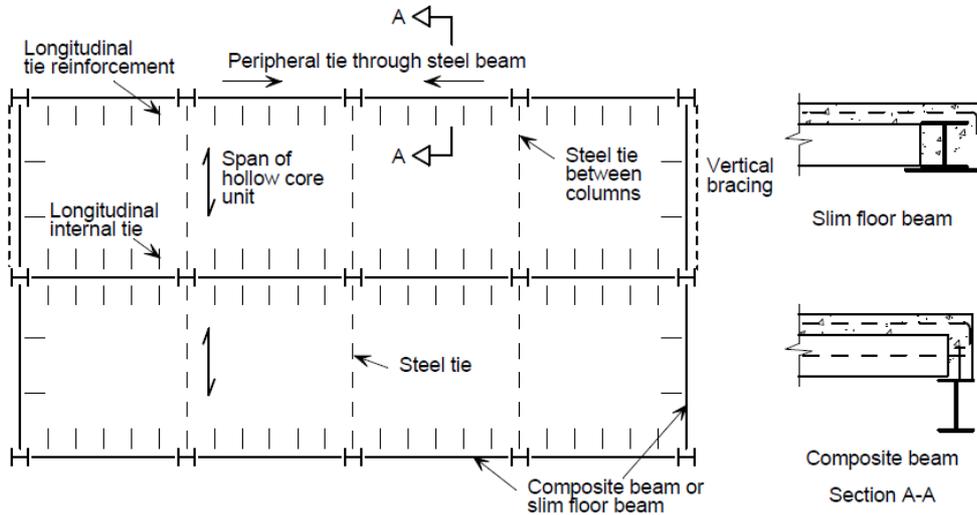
Tying action in the floor plate using precast slabs (after N 2040, 2020)
